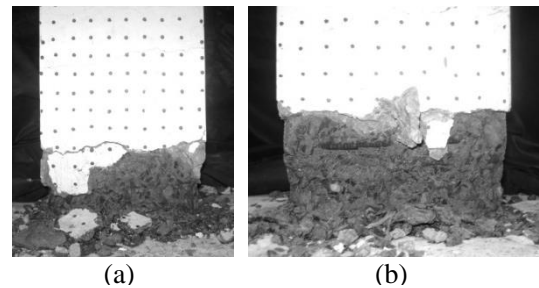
Final damage observed in CRCS-40-25 column cast with 25 MPa concrete (a) positive loading face (b) Negative loading face
